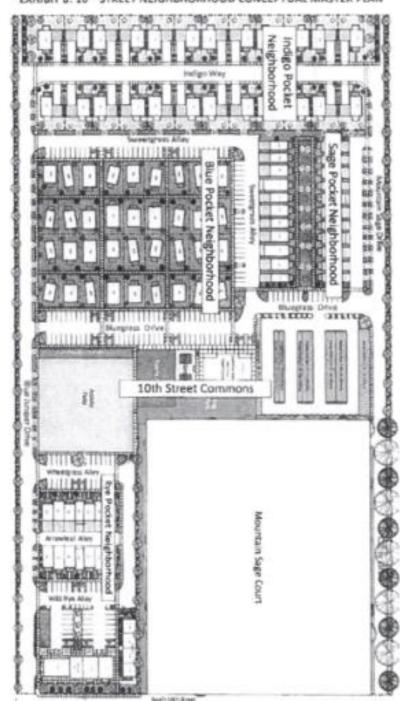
" STREET NEIGHBHORHOOD CONCEPTUAL MASTER PLAN
